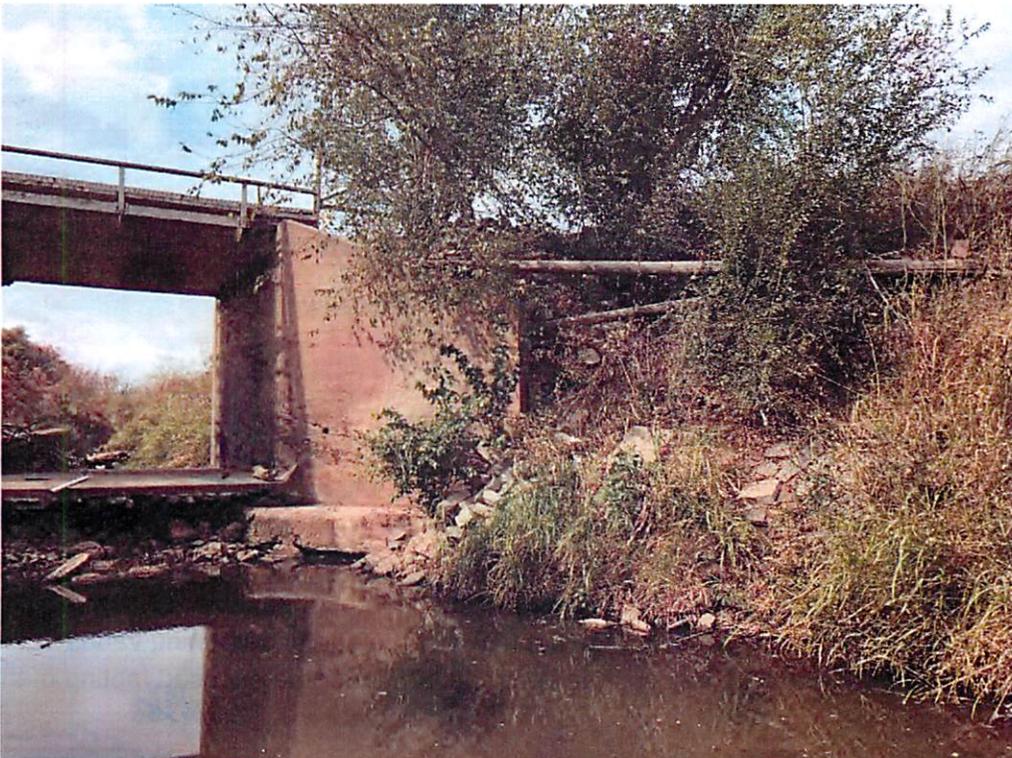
undermining and erosion at the downstream wingwall of the north abutment.
